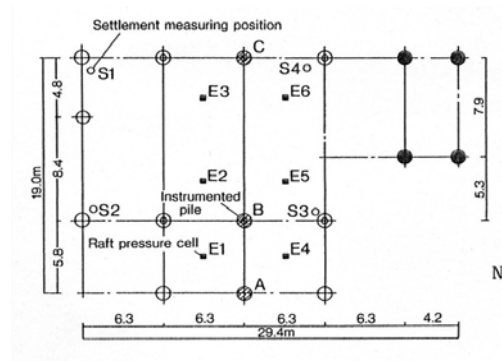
Foundation plan with layout of piles (Yamashita et al., 1991)
